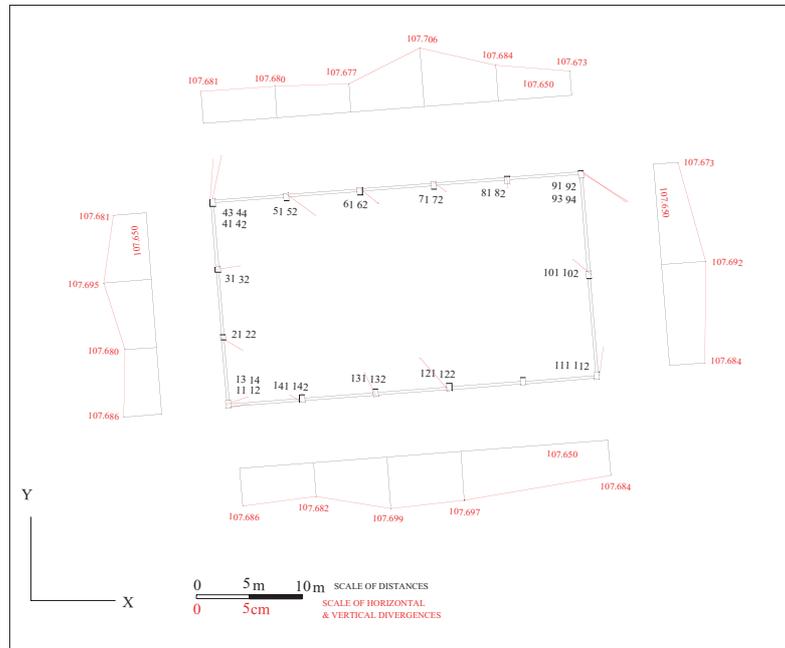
Horizontal and vertical divergences of the columns of the two floor precast construction.
